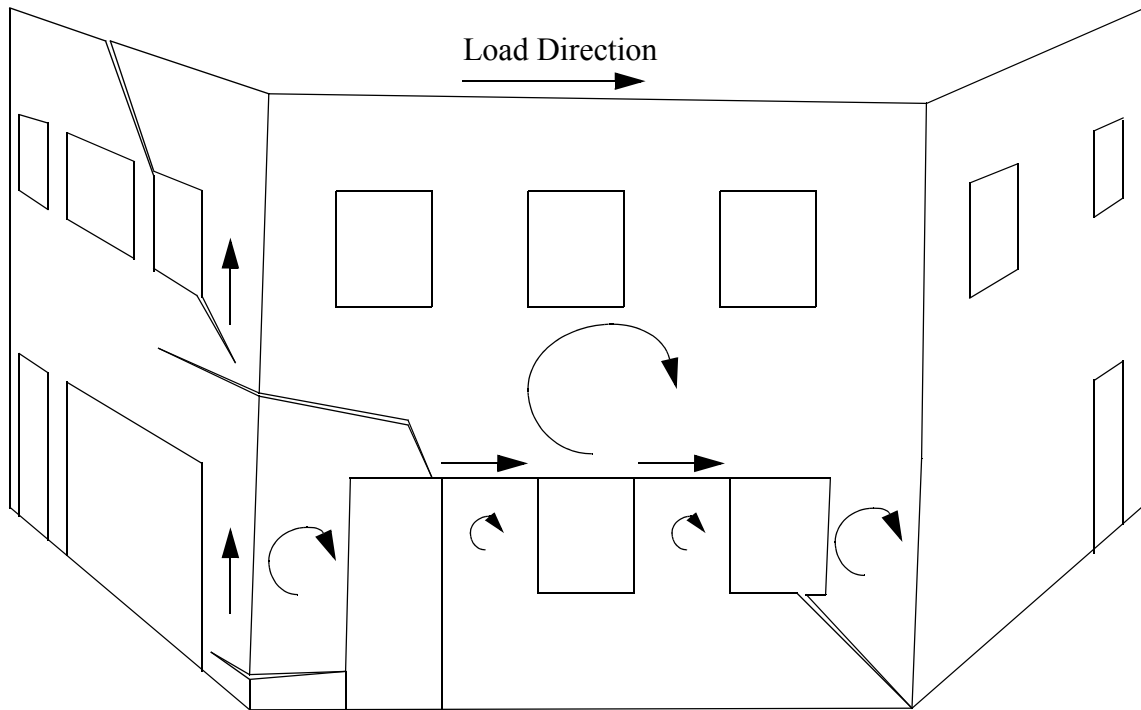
Exaggerated schematic illustrating the behavior of Wall B and out-of-plane Walls 1 and 2 in the negative direction prior to retrofit.
